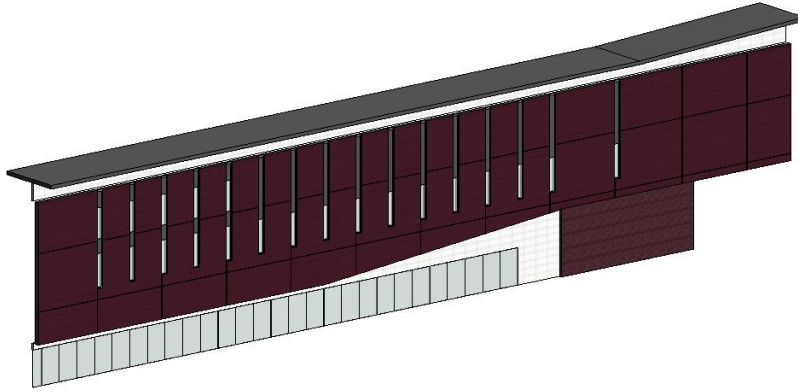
Original South Facade with Expansion Joints and Brick Angles
